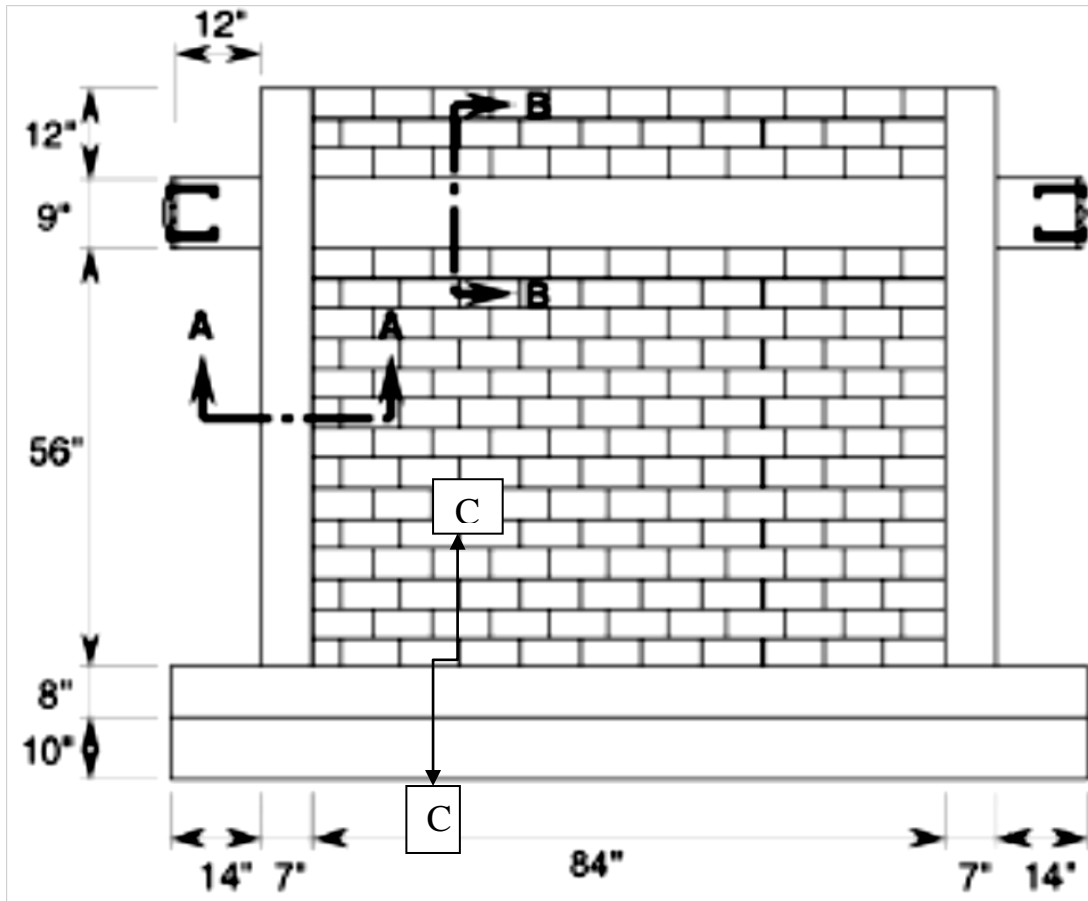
(a) Detail and Geometry of RC infilled Frame
